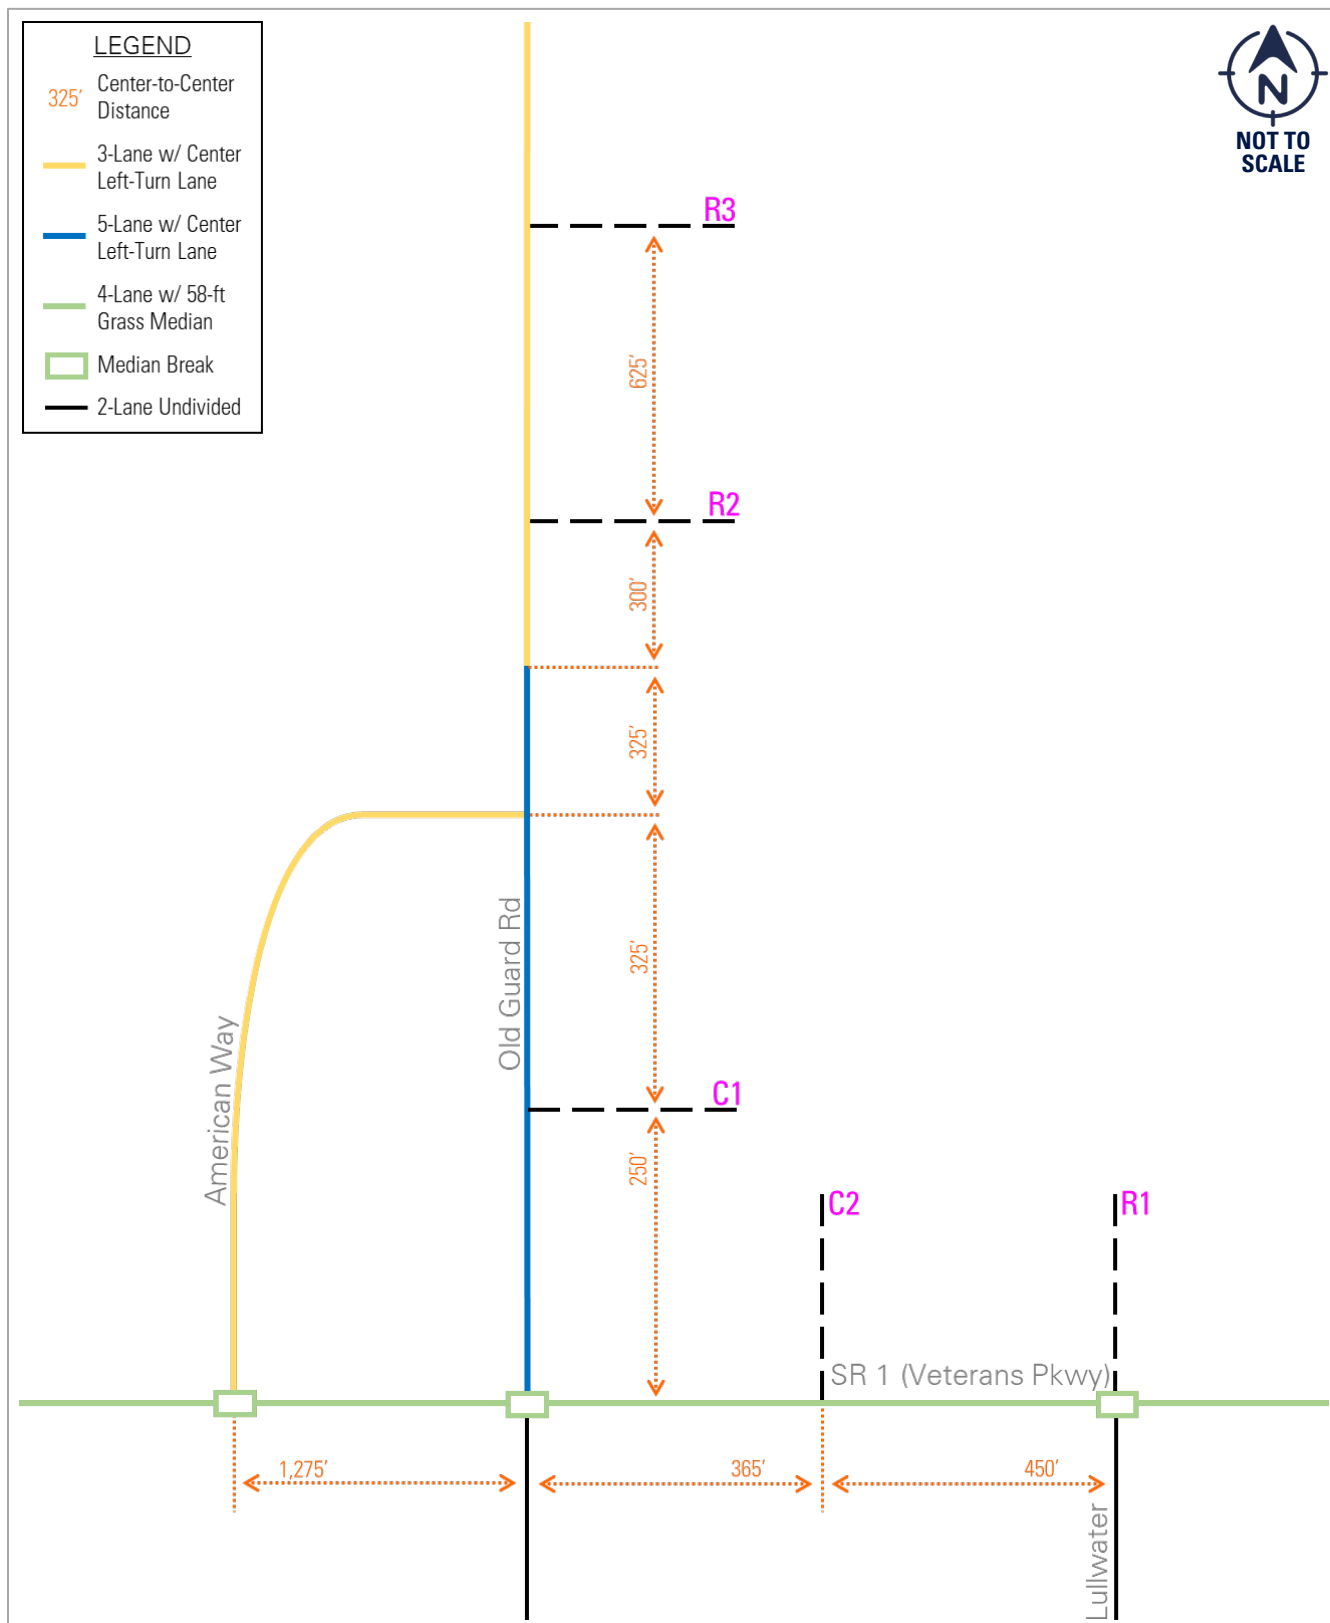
B: Existing Conditions - Traffic Control and Intersection Geometry
